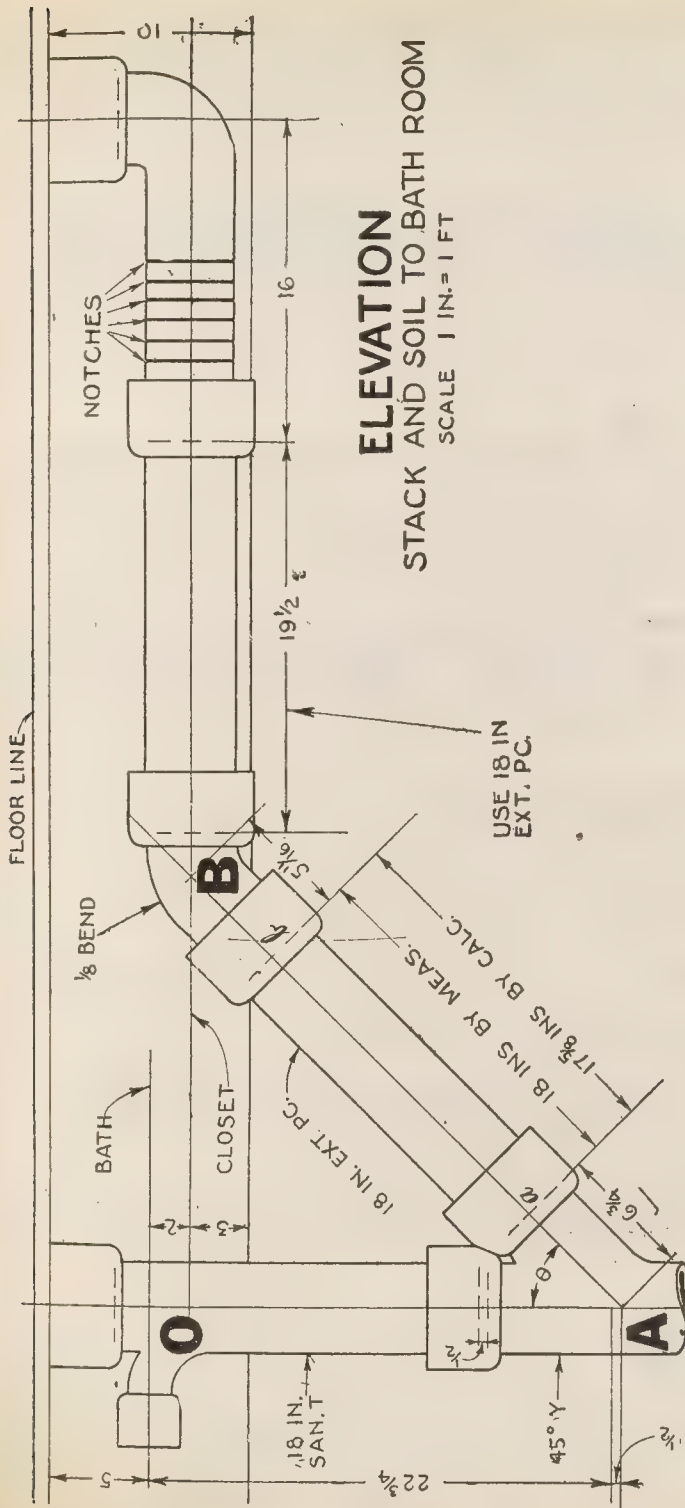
,965.—Elevation of roughing in for bath room using close connected closet connection (instead of the connection with lead sleeve shown in fig. 6,947) corresponding to the center line layout of fig. 6,964.
